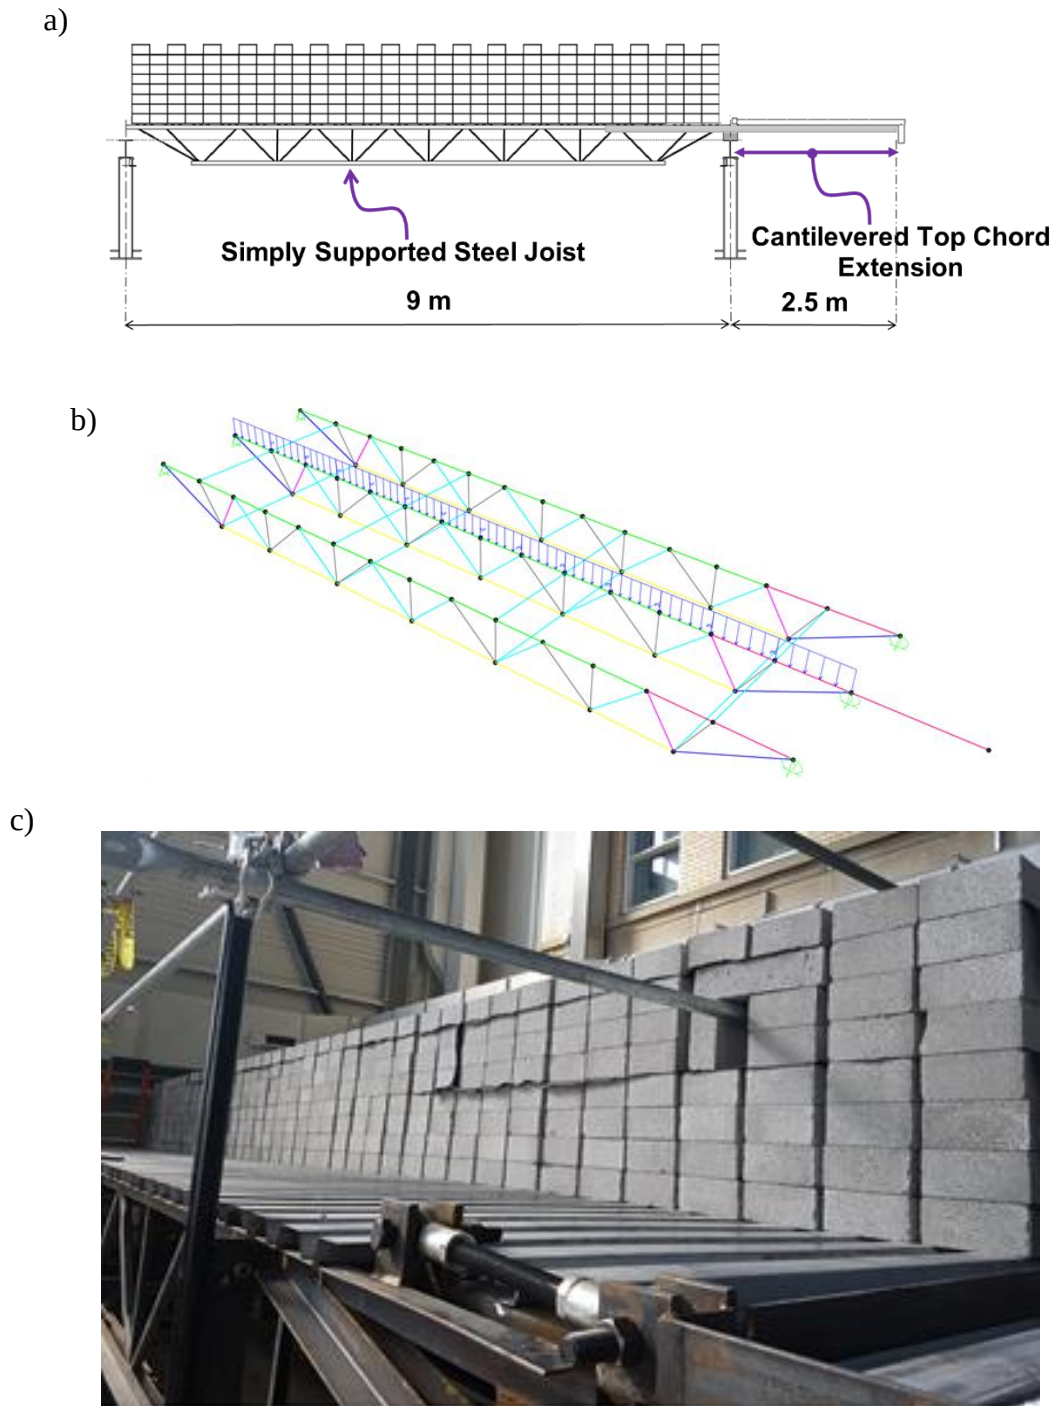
Gravity load on the interior joist span: a) Loading diagram; b) SAP2000 analysis of the 3-joist assembly after removal of the diagonal bridging members and deck panels; and c) Masonry blocks used to apply the gravity load on the central joist.
